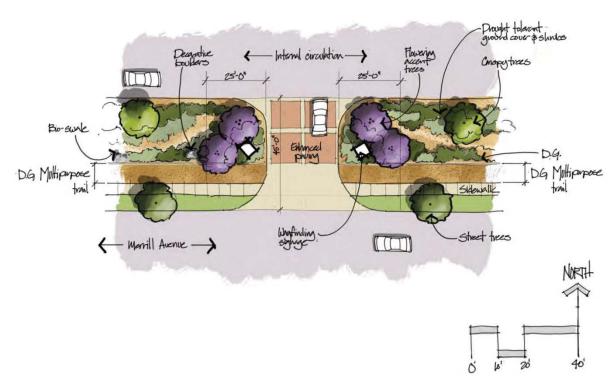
Merrill Avenue Conceptual Project Entry
